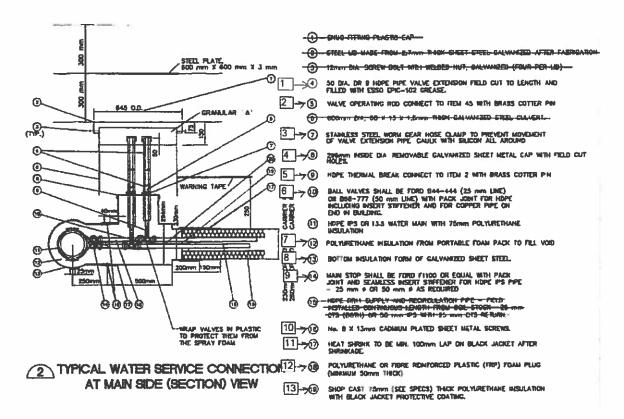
Detail 2 - from Drawing C-330 - Water service connection Kit at main
